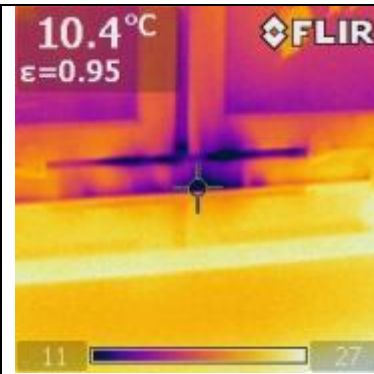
Leak trough crack in window frame and between window frame and arch.
